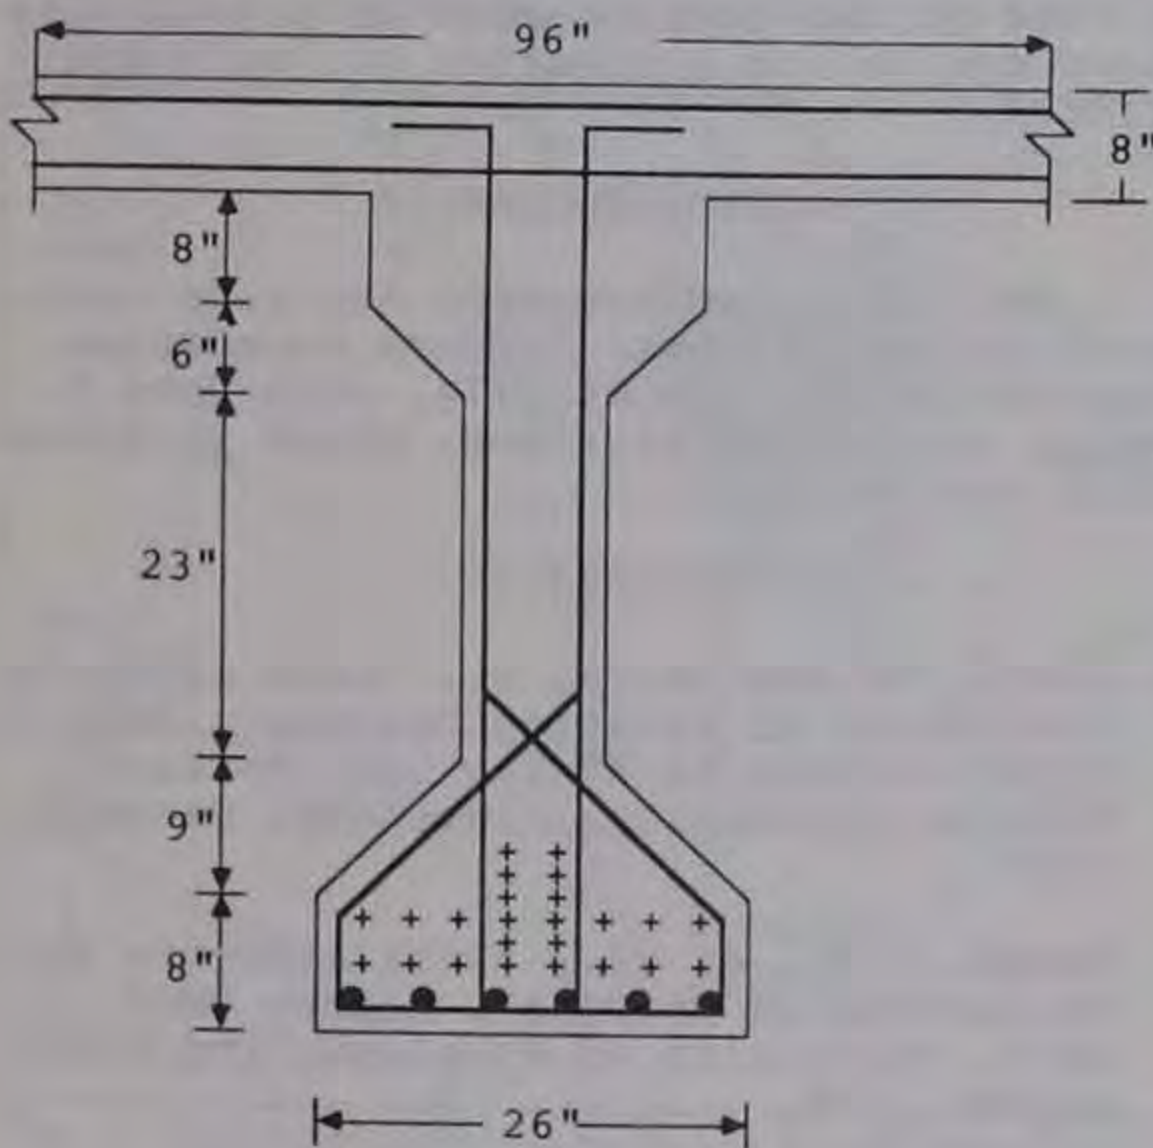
Cross-Section of a Prestressed Concrete Girder.
